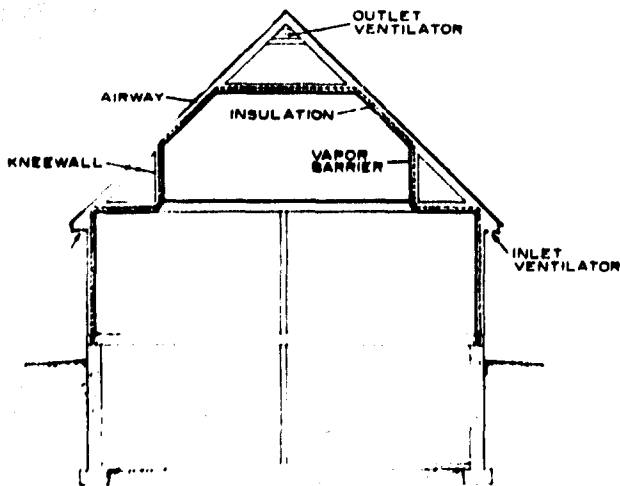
Location of vapor barriers and insulation in 1-1/2-story house with basement. M 139 234
